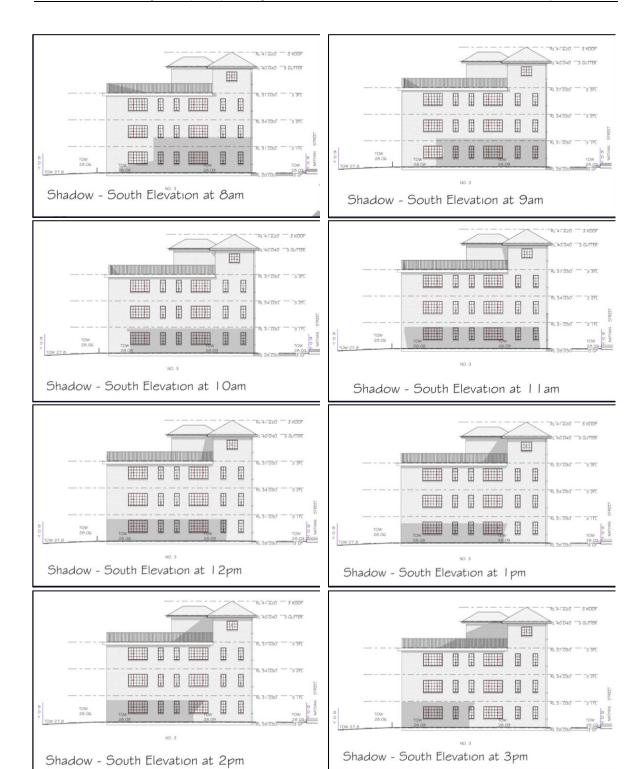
Elevational shadow diagrams to No.3 Nathan Street between 8am and 4pm on June 21st.
